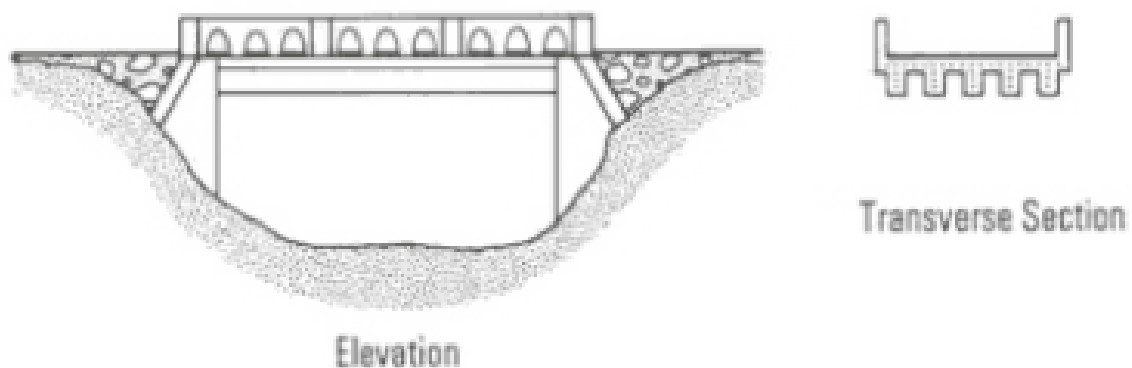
CONCRETE TEE BEAM BRIDGE.
